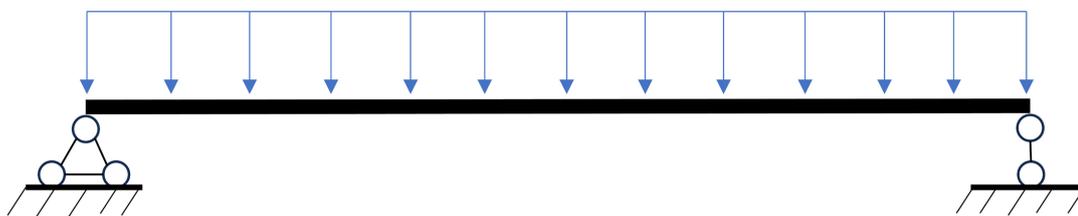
Schematic diagram of reinforced concrete simply supported beams subjected to uniform load
